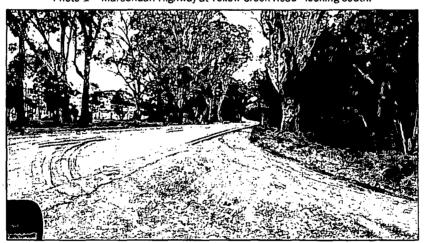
Maroondah Highway at Yellow Creek Road - looking south.
